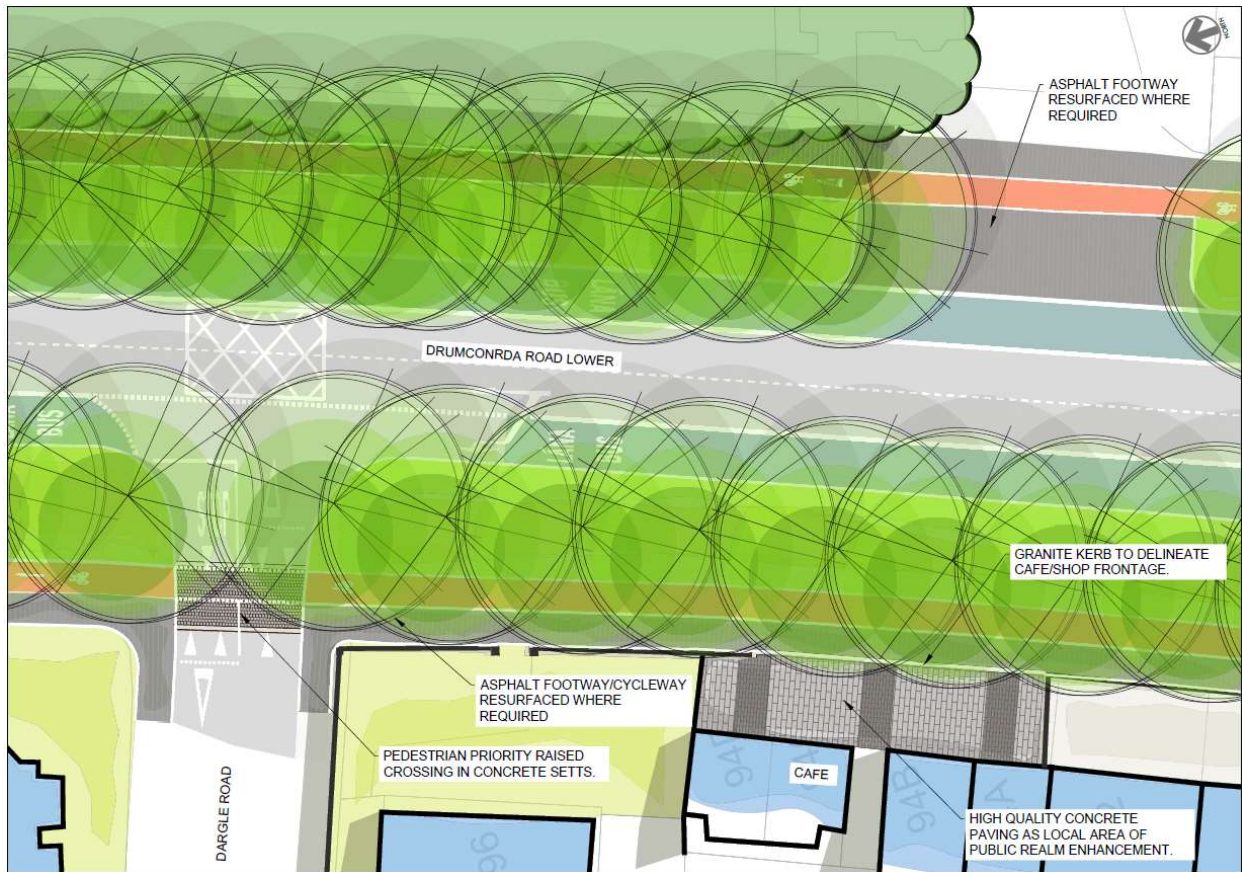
Café and Footways in the Residential Area West of Drumcondra Road Lower Design
